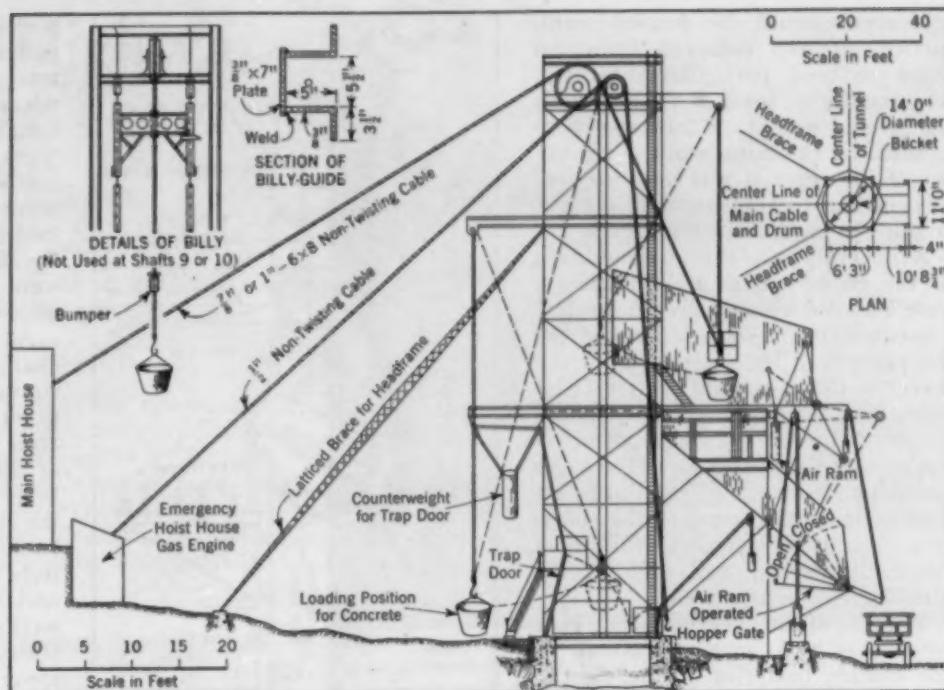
TYPICAL HEADFRAME AND HOPPER FOR CONSTRUCTING SHAFTS 7-10
